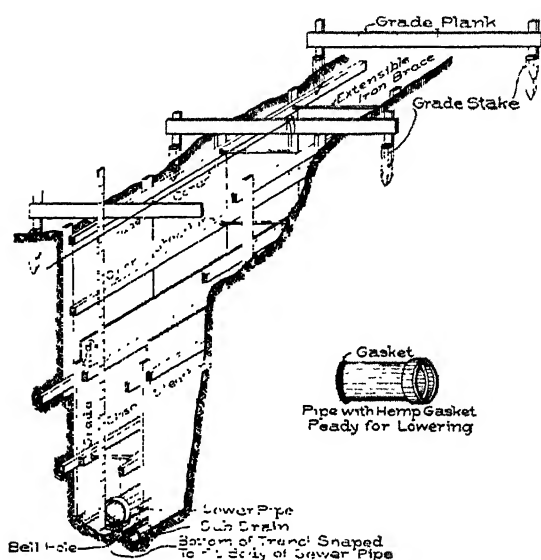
Diagram Showing Construction of Pipe Sewer.
